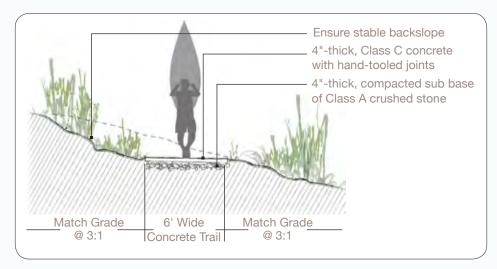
C-2. Typical Cast-In-Place Concrete Trail
